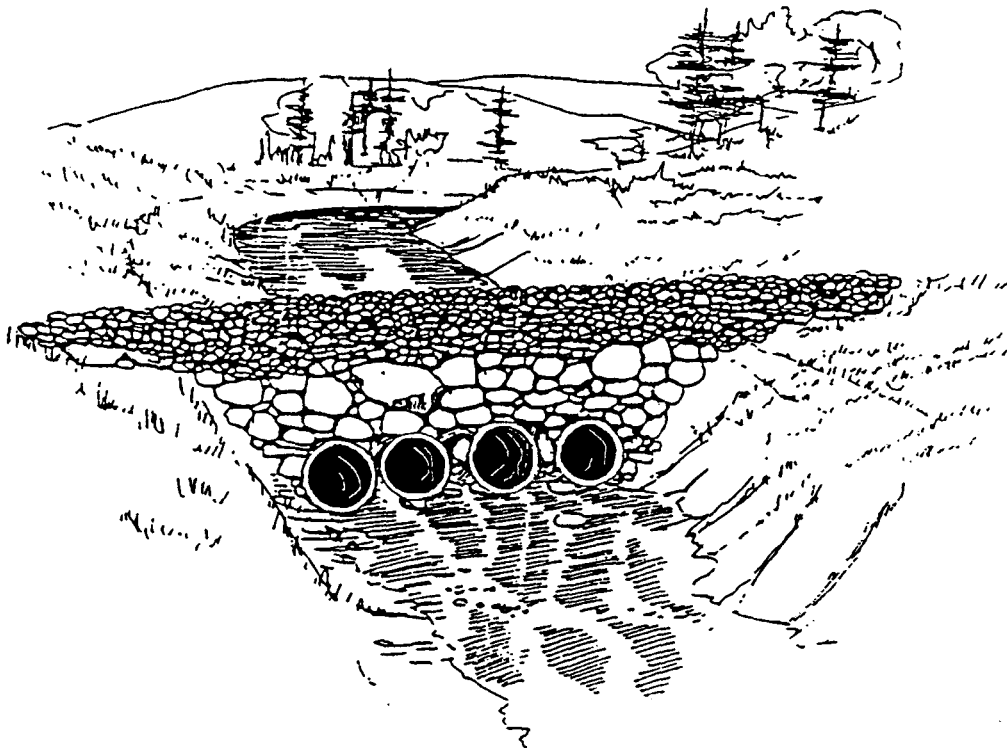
Constructing stream crossings by providing a culvert or bridge.
